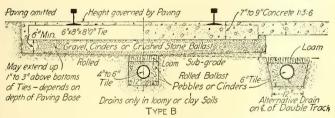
TYPE B—BALLASTED TRACK CONSTRUCTION RECOMMENDED BY THE AMERICAN ELECTRIC RAILWAY ENGINEERING ASSOCIATION
